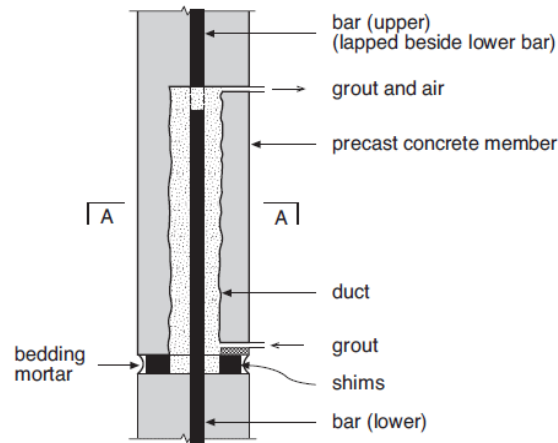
Example of an early Drossbach duct joint between precast concrete wall panels (excerpt from CAE 1999)
